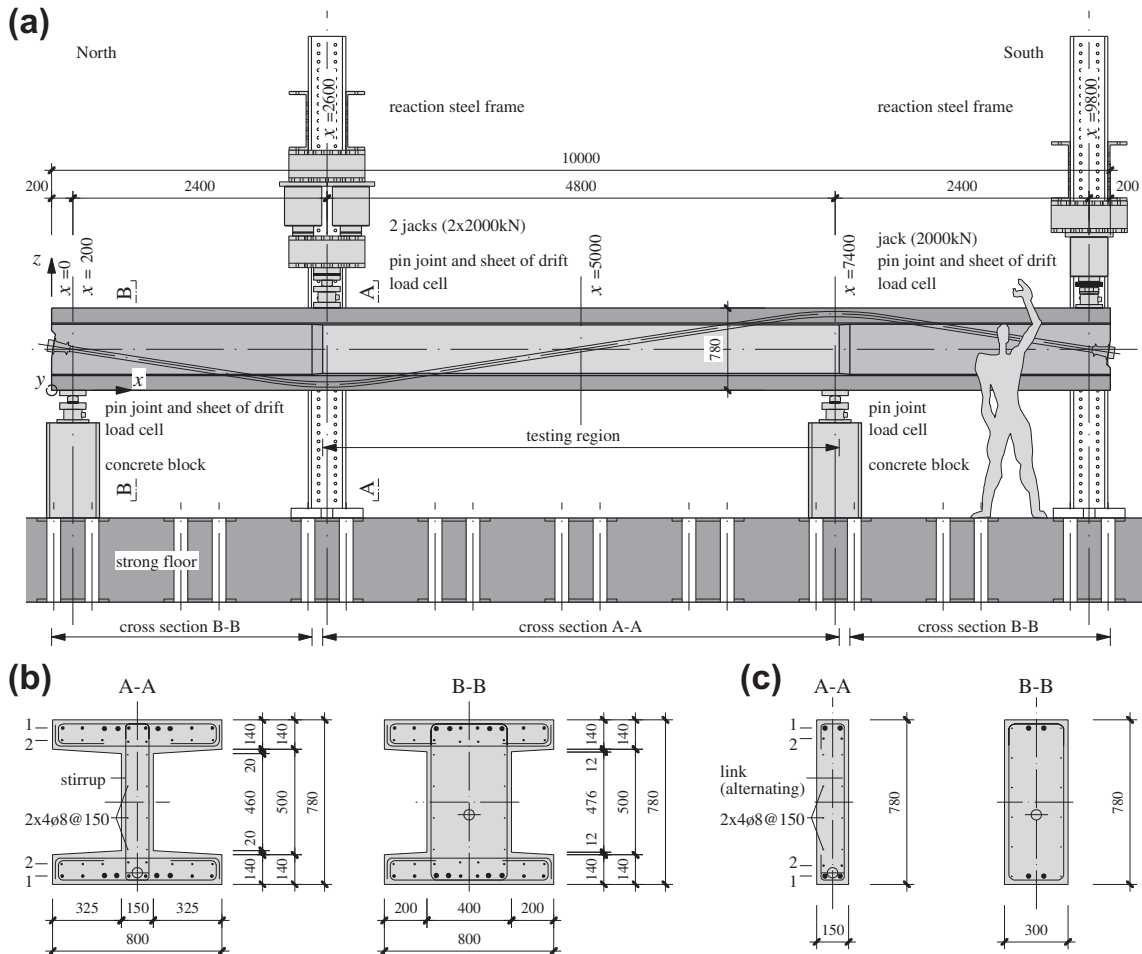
Test setup, geometry and reinforcement of the specimens (dimensions in mm): (a) longitudinal view on the test setup; (b) cross sections of beams with flanges; (c) cross sections of beams without flanges. Reinforcement layers 1 and 2: see Table 1.
